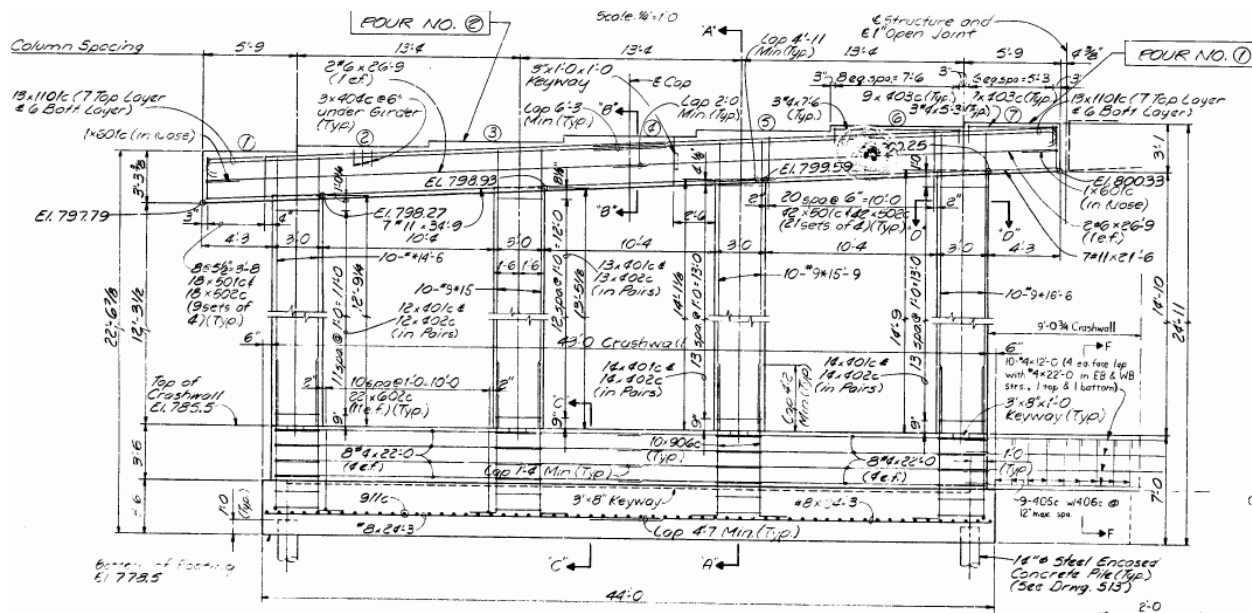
Transverse Elevation of Interior Pier (NBI 32841) (1987)
